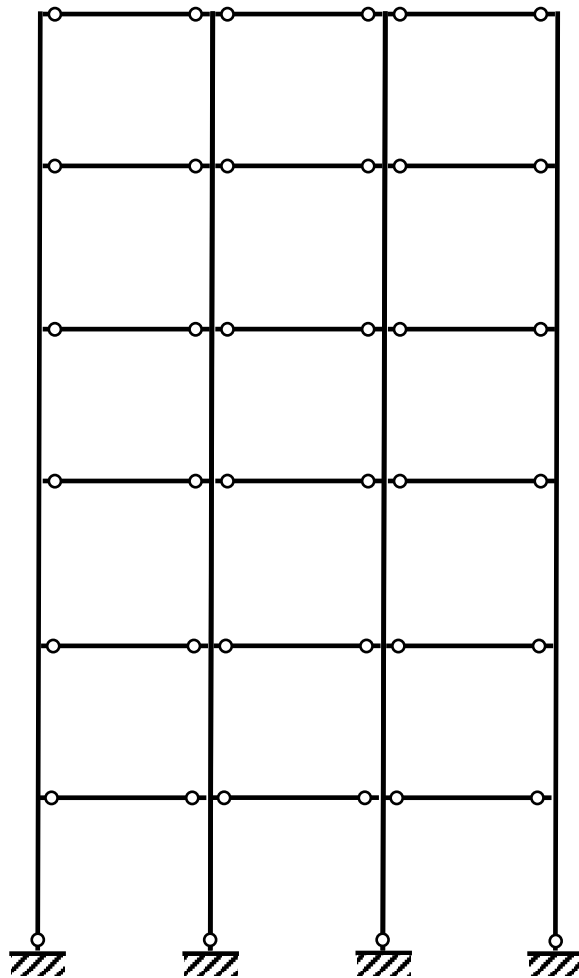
3 Bay 6 Story Frame with Column Base Semi-Rigid Connections
